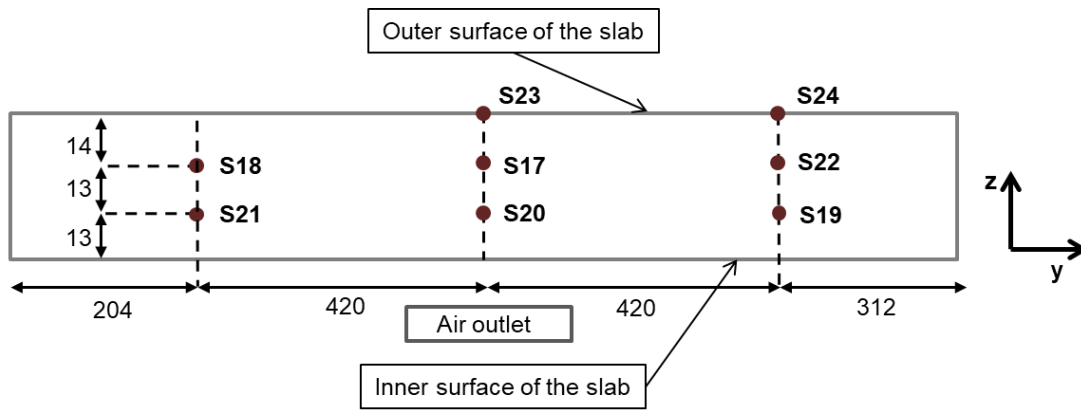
Numbering of the thermocouples placed in the slab core (dimensions in millimeters).
